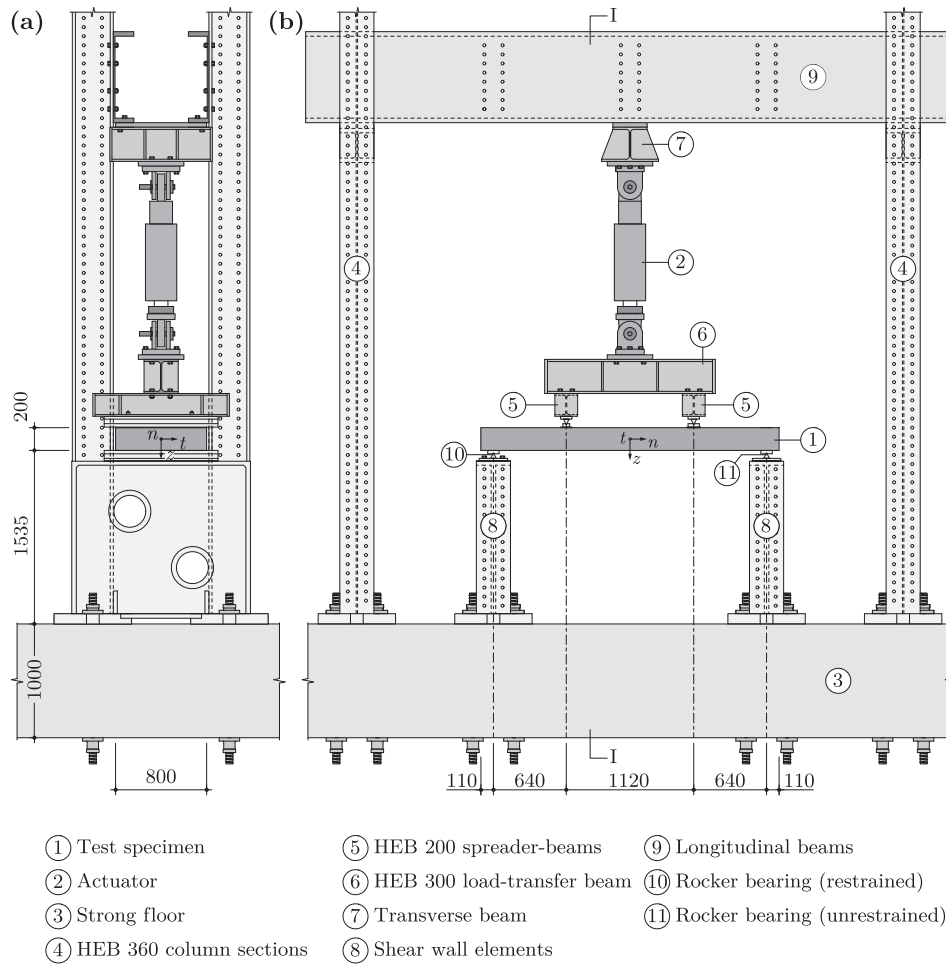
Test setup: (a) section I-I; (b) front view. Dimensions in mm.
